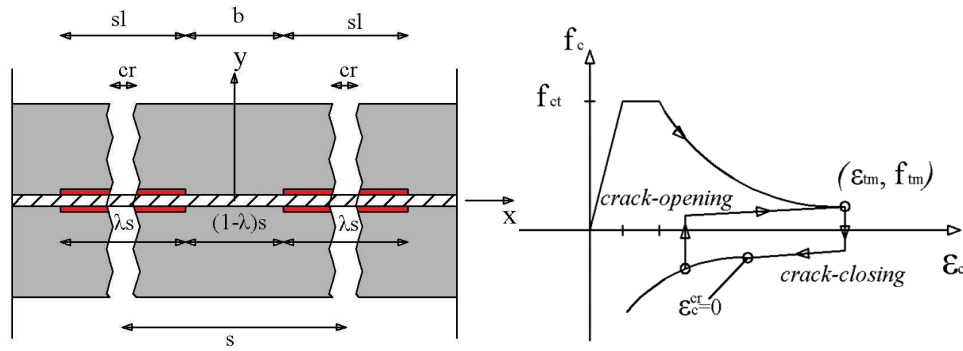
Cracked element of reinforced concrete and cyclic response in tension.
